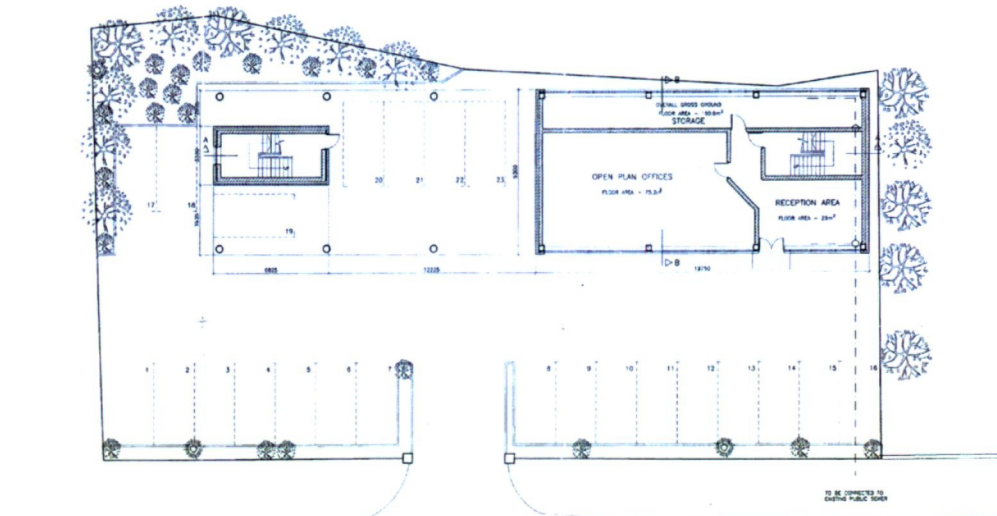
Extract of the Layout Plan of the development under Reg. Ref.: S00A/0121
